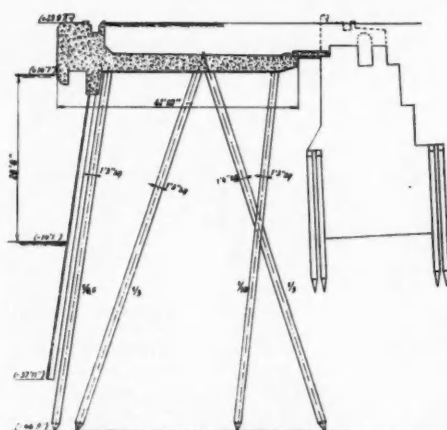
Cross-section Port Arthur Quay Wall Reconstruction. Length of wall 2,300 yards.
